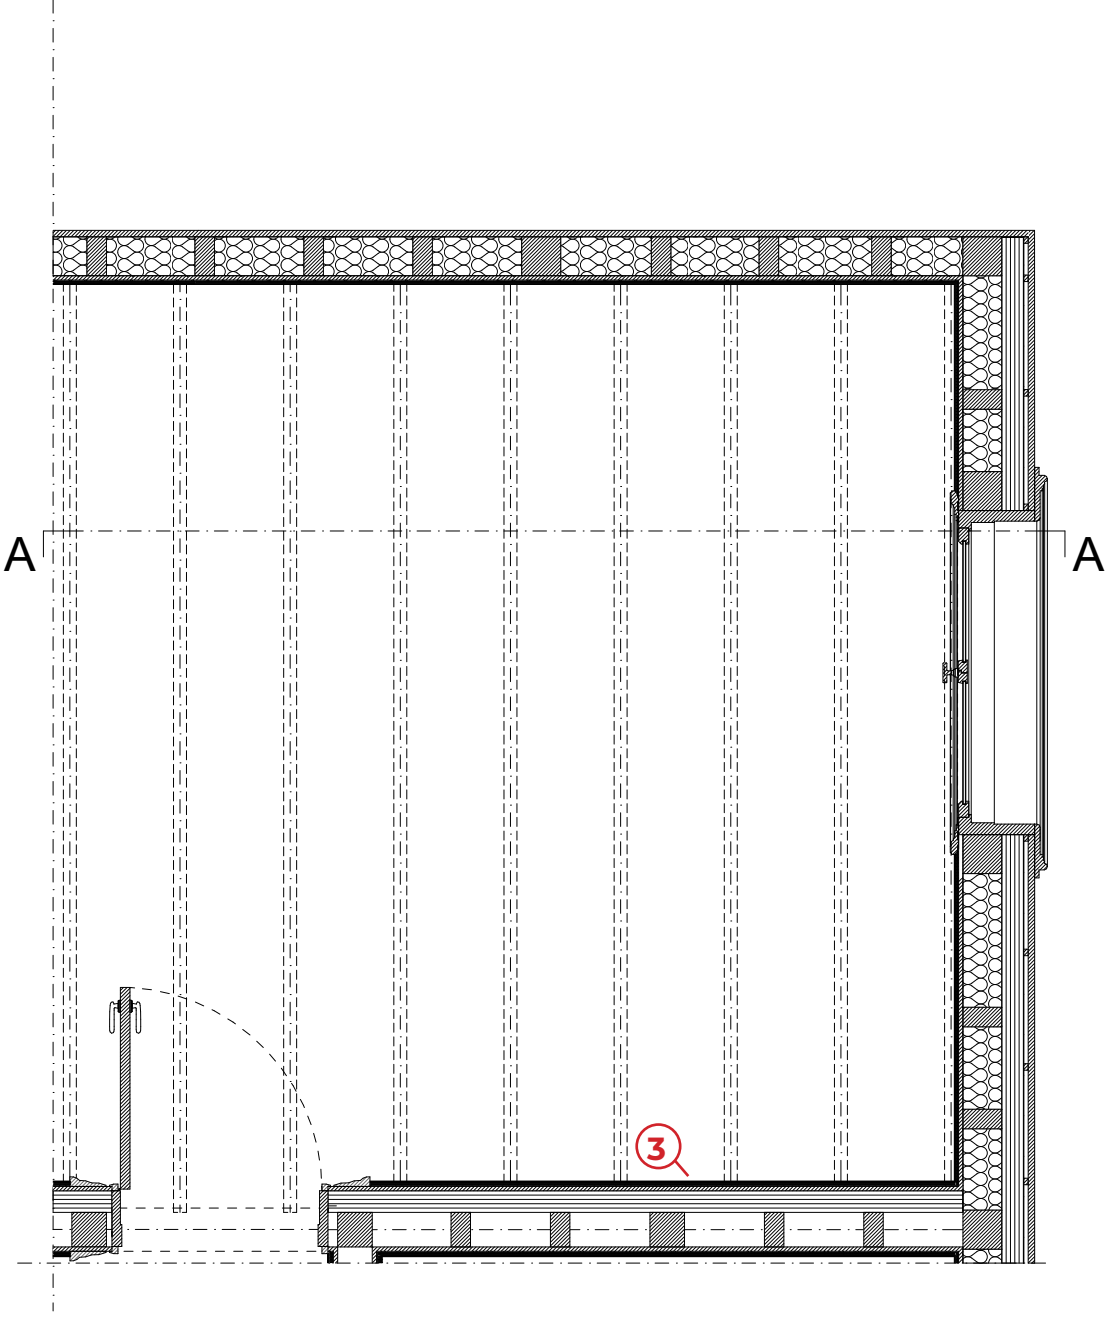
Consolidation Intervention Proposal Fourth Floor Detail Plan (Source: Created by the author, 2025)
